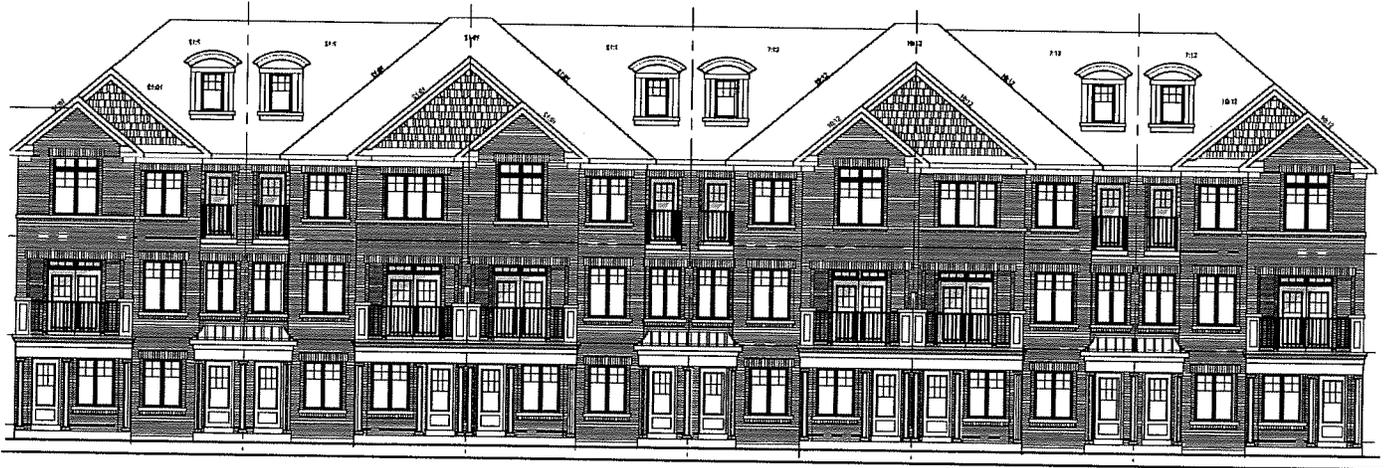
Conceptual Elevations (Sheet 4 of 6)
